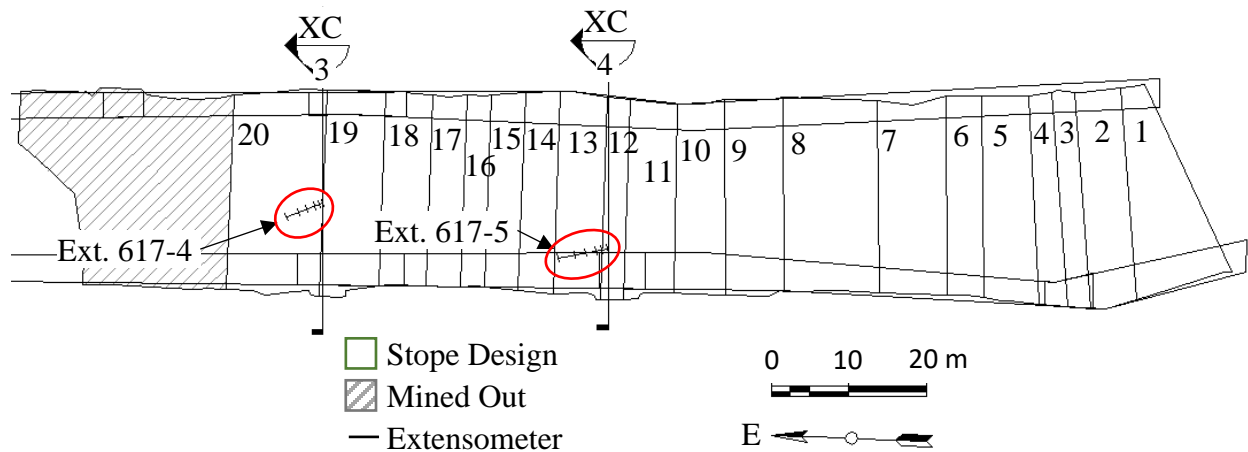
True longitudinal view of the Santoy 30-31L longhole stope hanging wall looking south and showing stope outlines and instrument locations.
